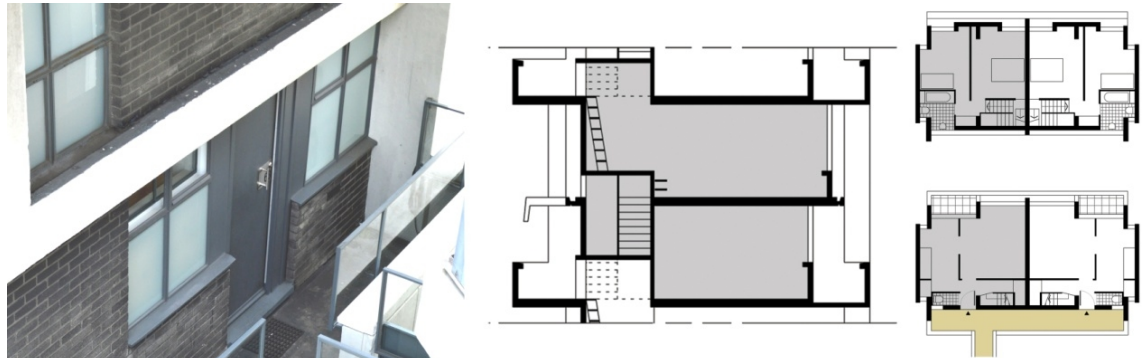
Keeling House, Elevation (Summer 2013), Section and Plans
